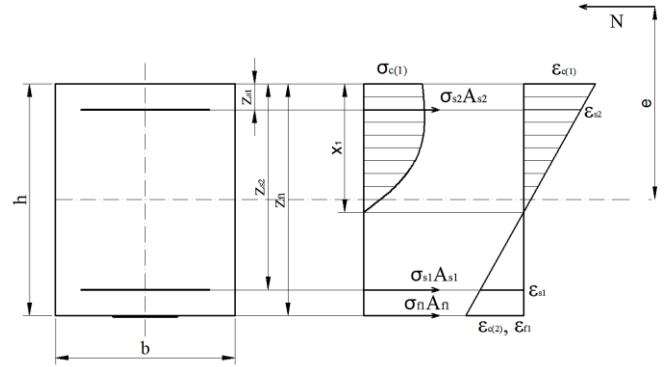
The design cross-section of the strengthened eccentrically compressed member with a rectangular cross-section: cross-section, stress diagram, strain diagram (from left to right)
